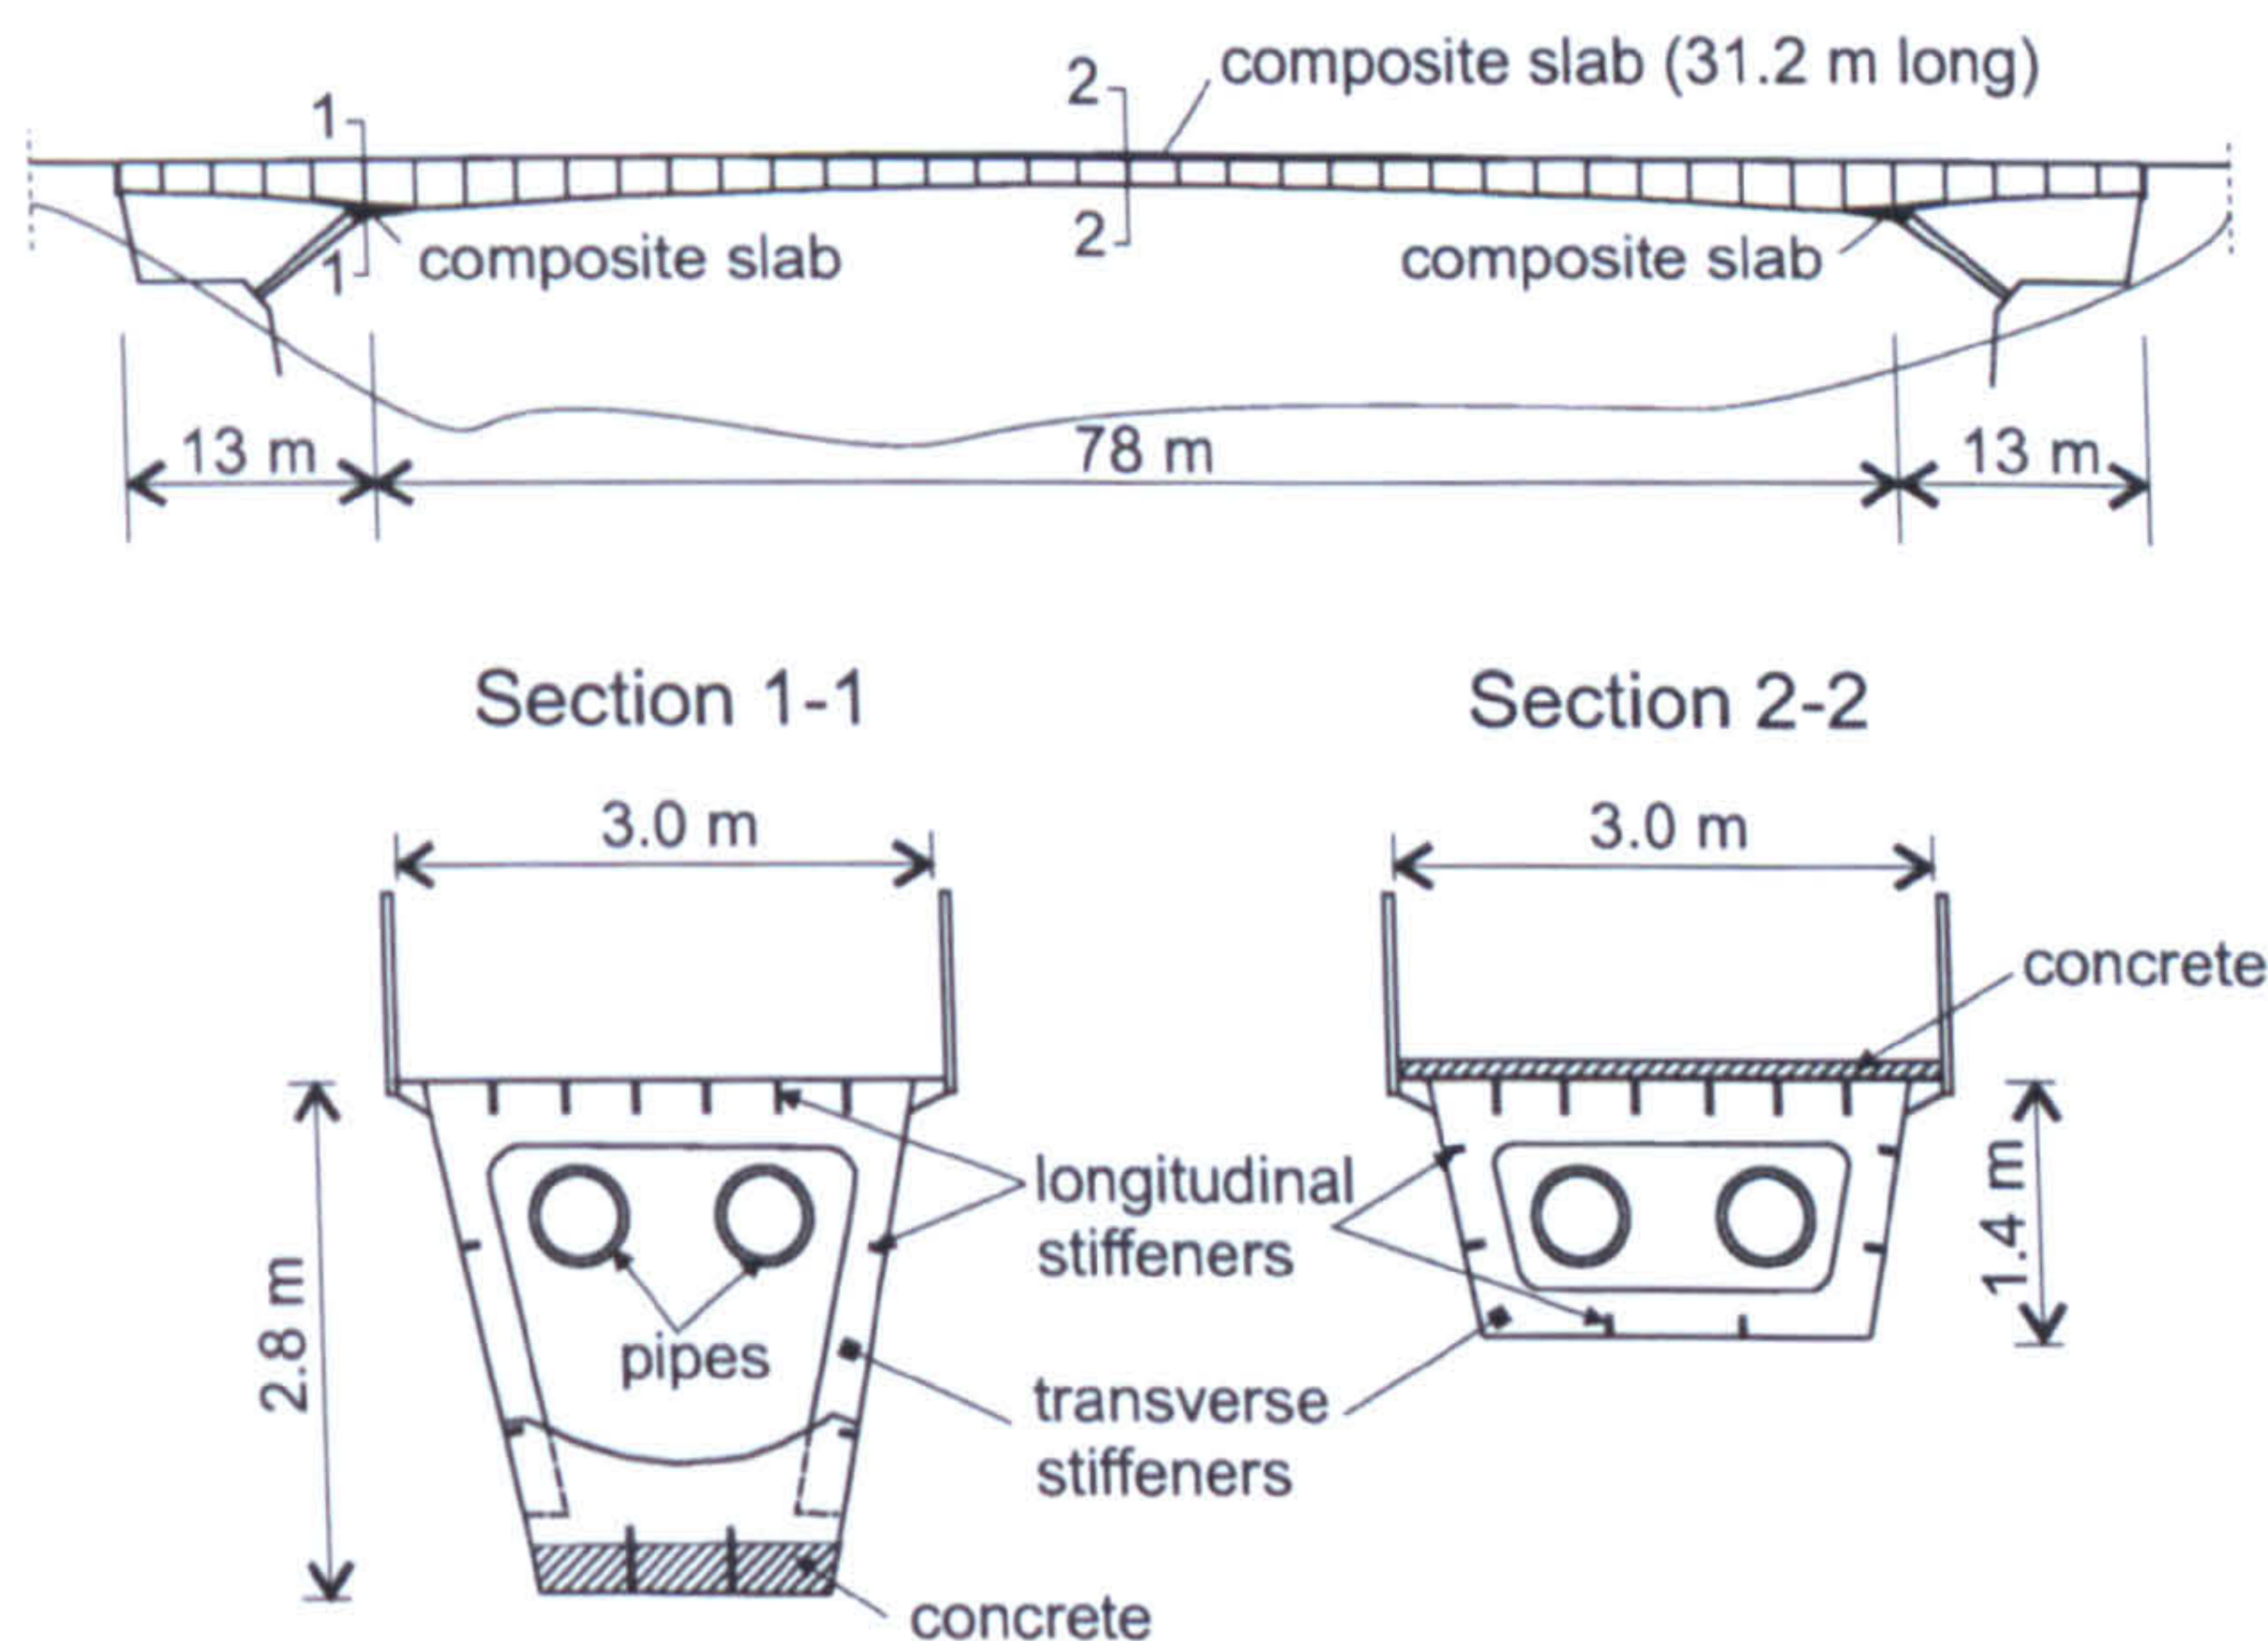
General arrangement drawing (not to scale) of Podgorica footbridge.
